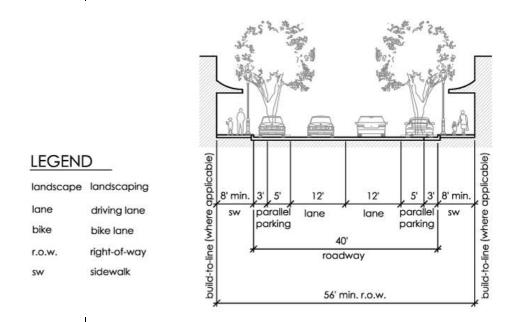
<u>-</u>44-4: <u>Typical</u> Collector Street on 30-acre Property (Buena Vista Avenue)
